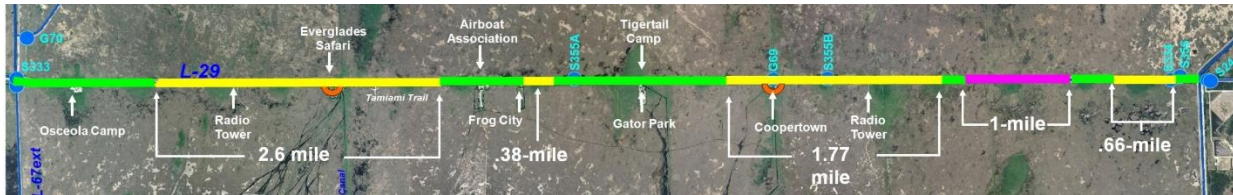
B. Tamiami Trail Next Steps recommended plan (Alternative 6e), with up to 5.5-miles of additional bridging (yellow) and complete reconstruction of the remaining roadway.
